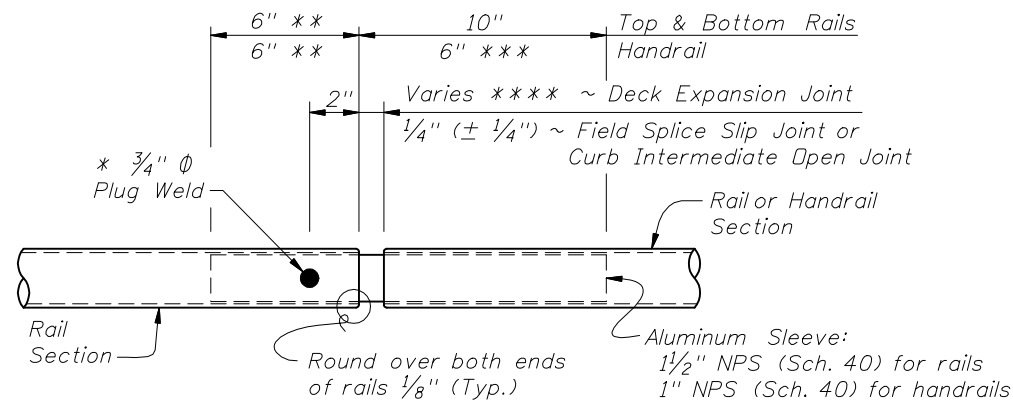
DETAIL "A" - SECTION AT INTERMEDIATE OPEN JOINT
